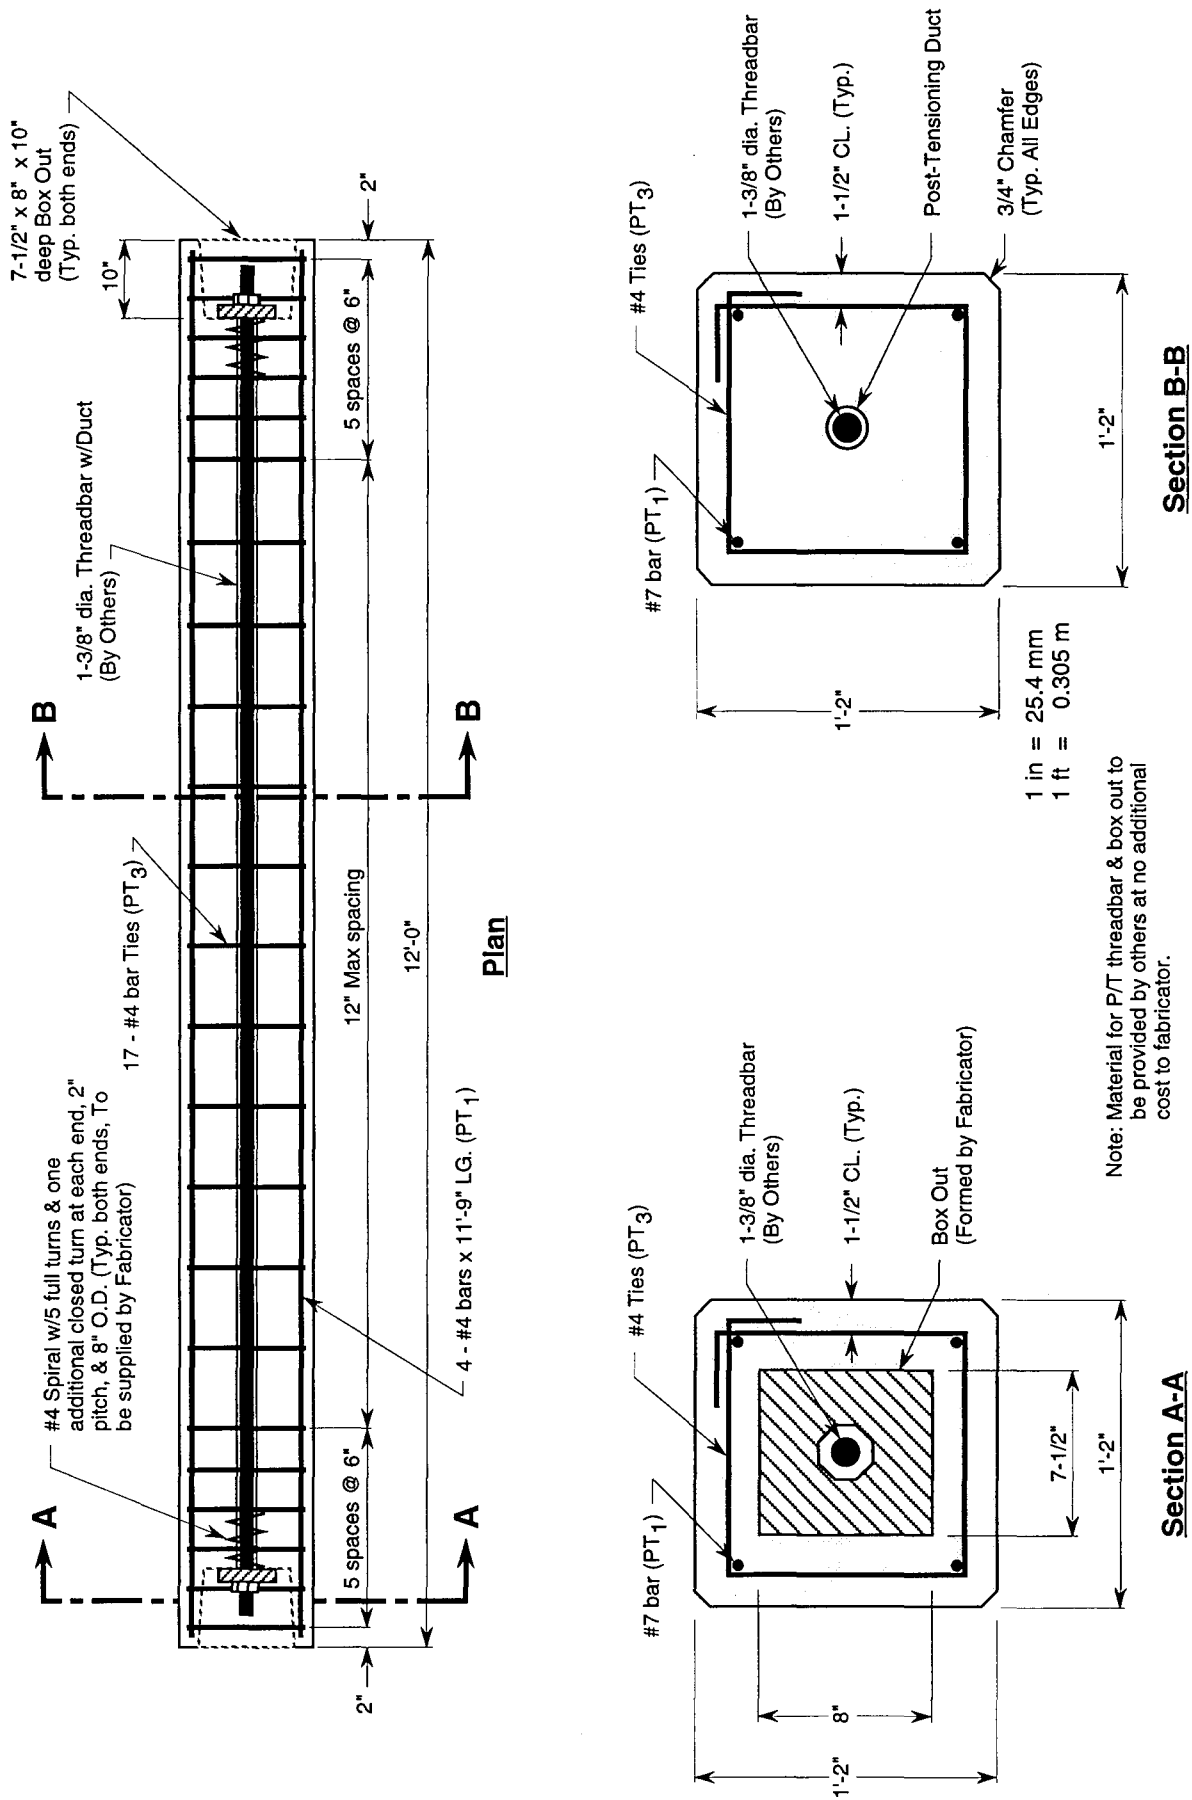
Design details for threadbar post-tensioned concrete beam specimens.
